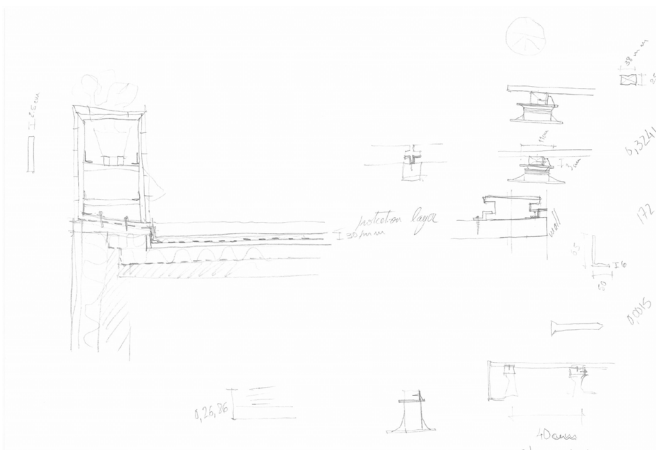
Sketches: Terrace railing supports for wooden flooring (elephant feet)
